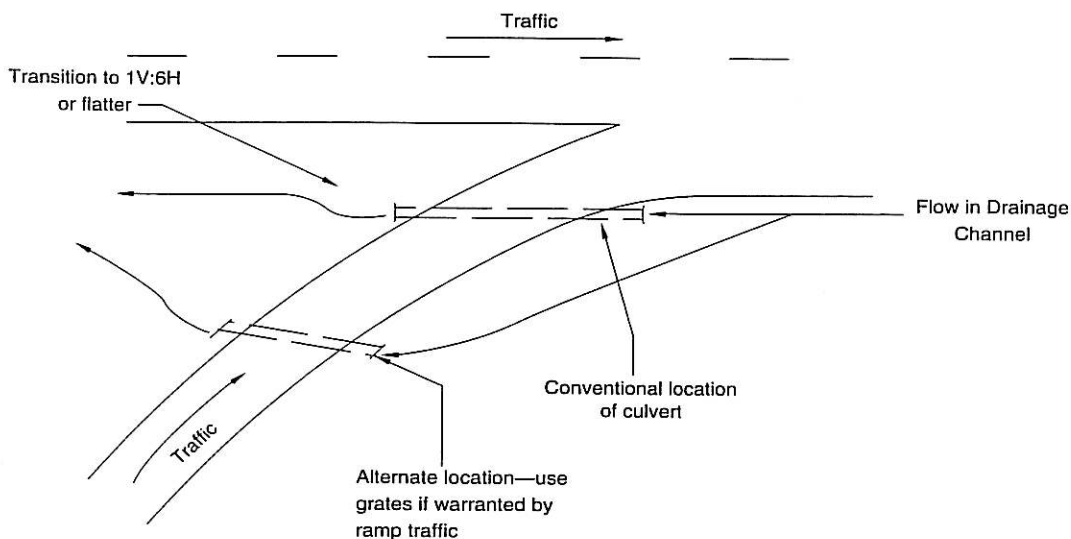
Alternate Location for a Parallel Drainage Culvert
